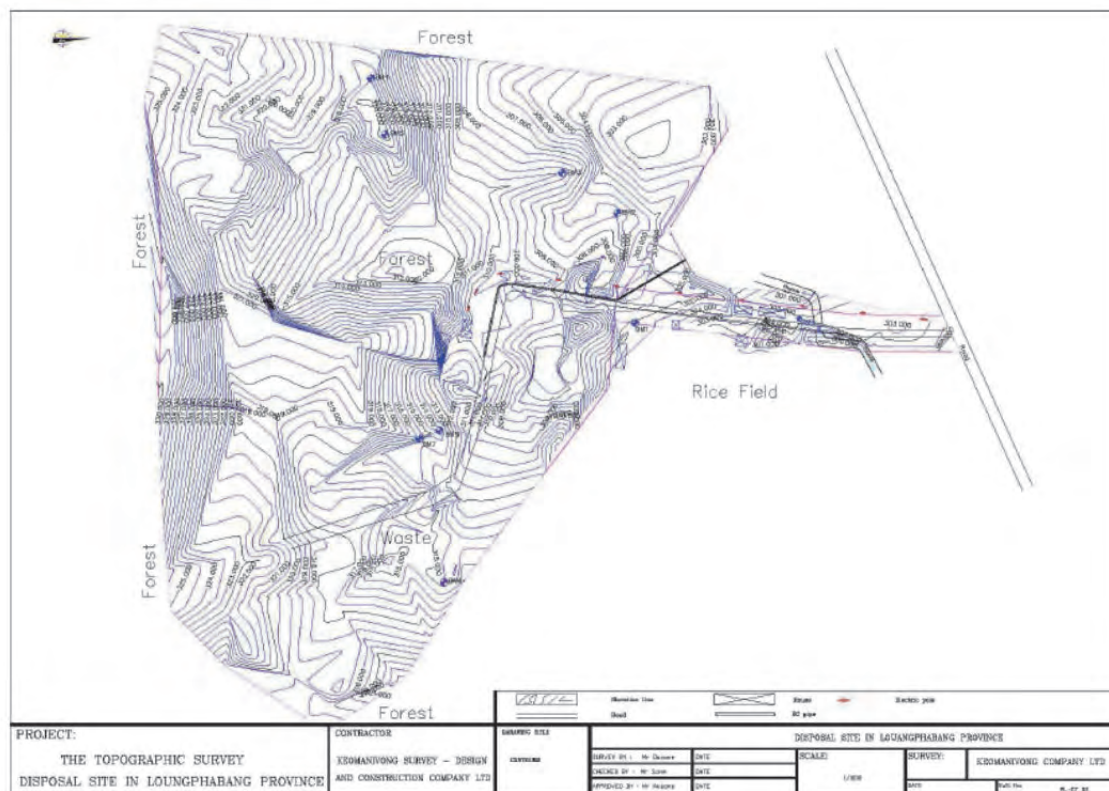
The boundary of pilot area at KM8 existing final disposal site
